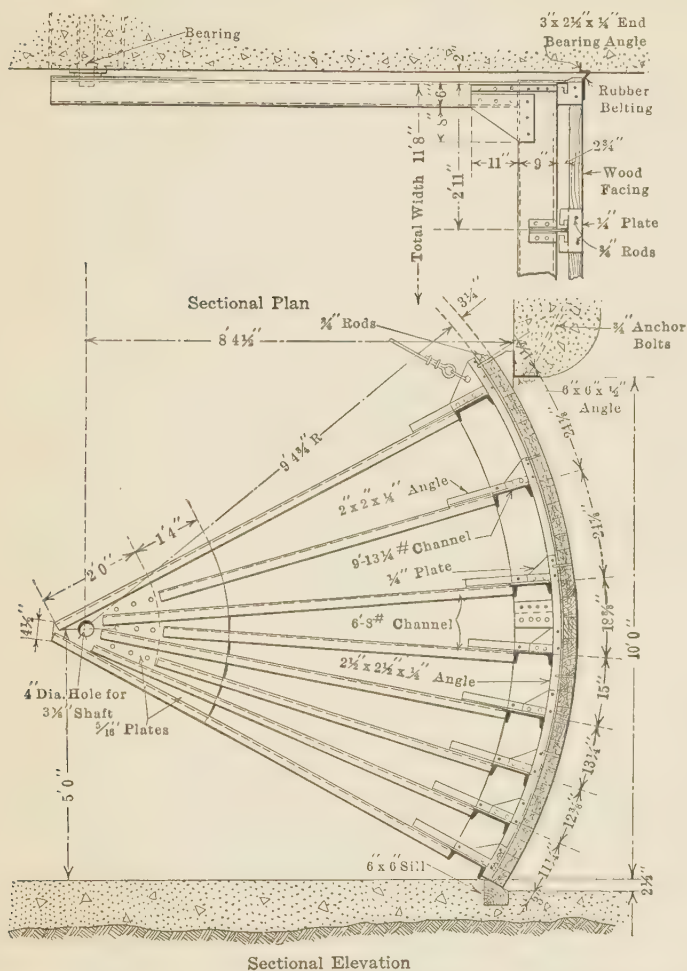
Ten-foot radial gate for canal headworks. Upper Salmon Falls Power Plant, Idaho.
